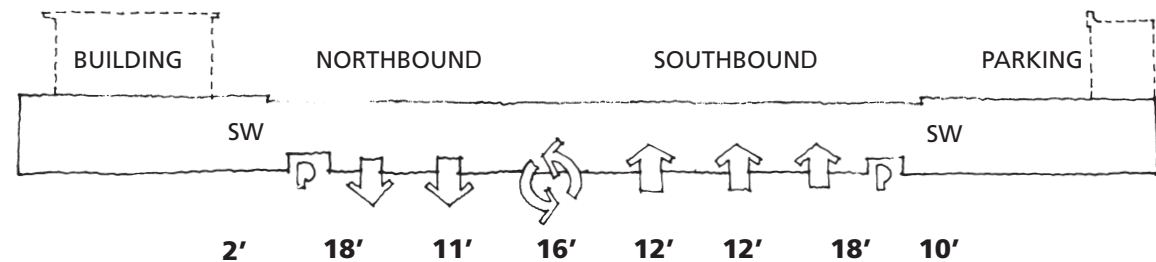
Existing street section in southern part of the study area. View looking south.
